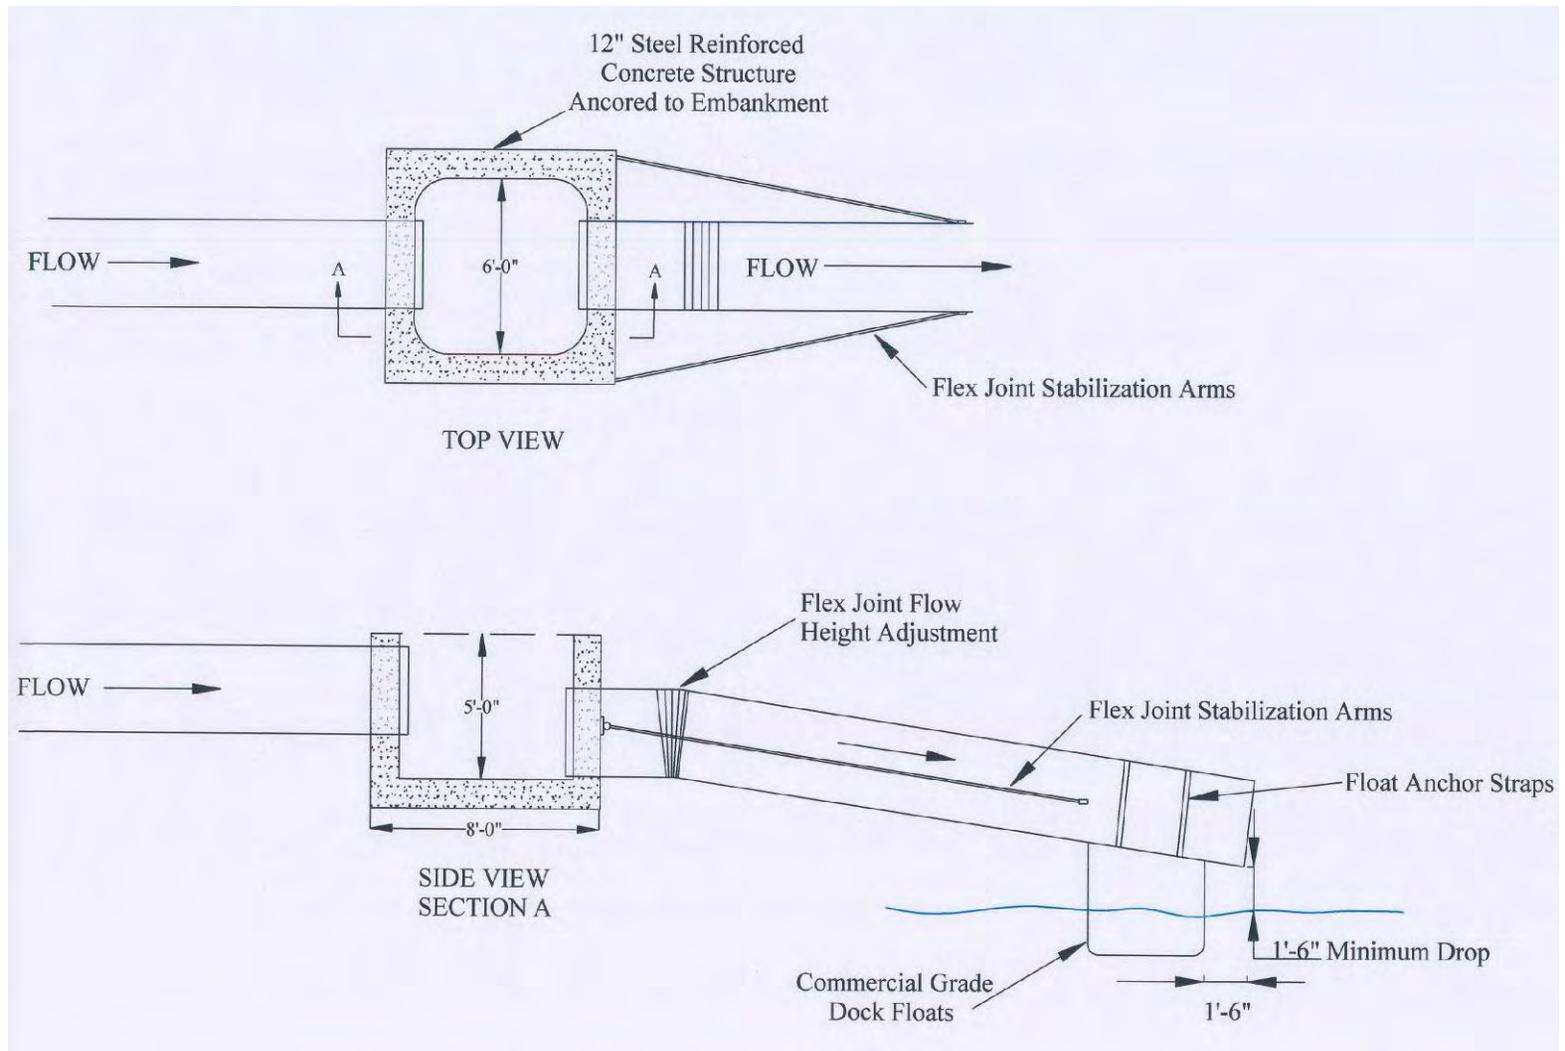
Conceptual drawing of downstream fish collection and pipe pivot structure located downstream of Menominee Dam.
